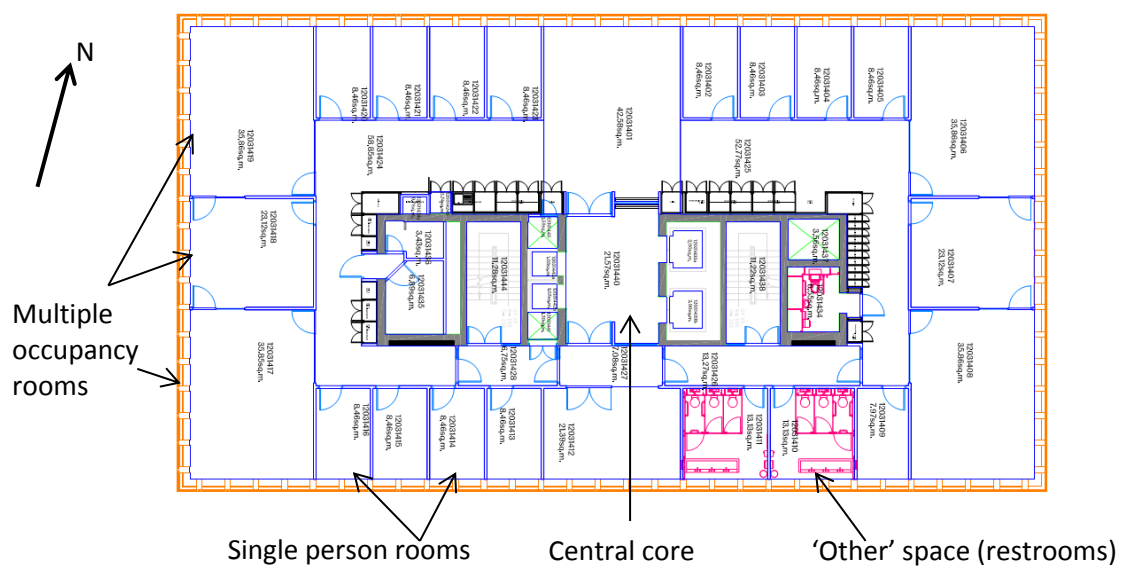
Typical floor plan of Building (UoS Estates and Facilities Management, 2007)
